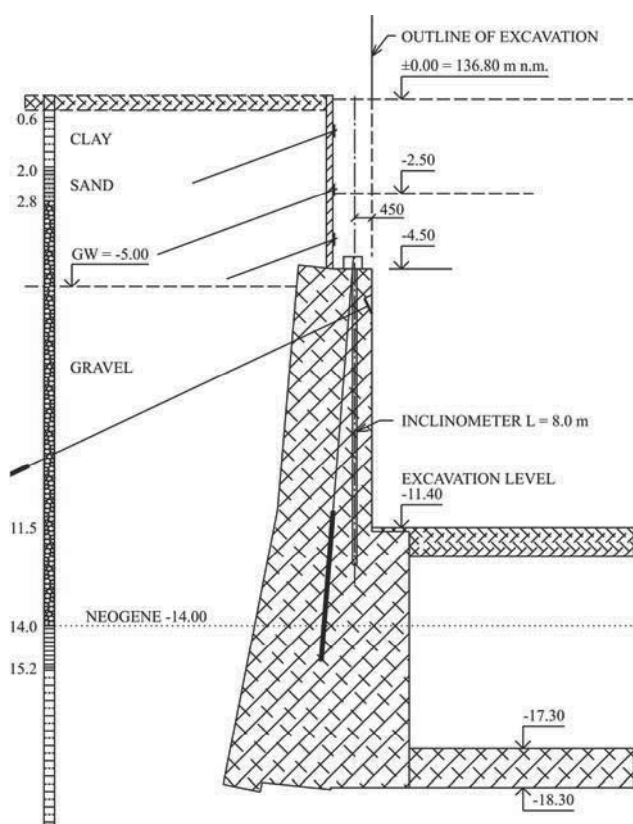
Cross section of retaining structure made by soil nailing and jet grouting.
